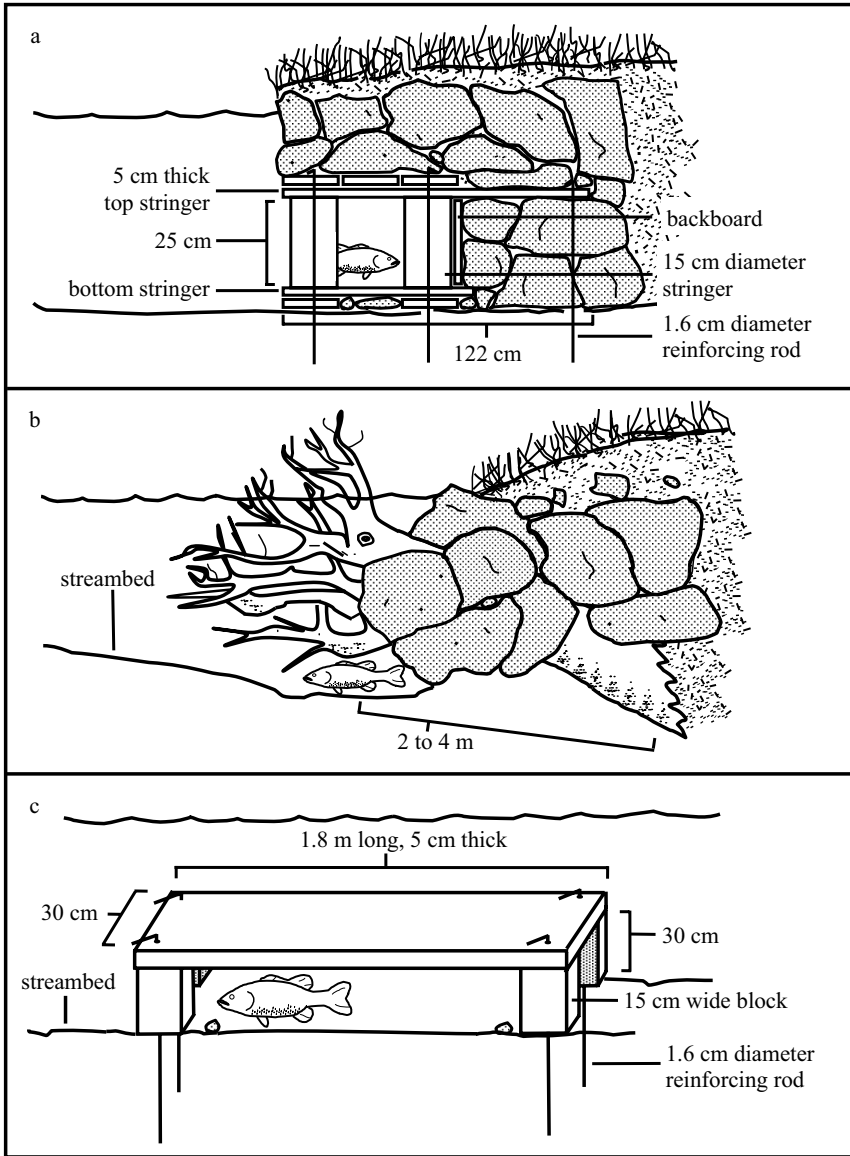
Lateral view of an installed LUNKERS (a) and rootwad enhancement structure (b). Side view of a modified Hunt half-log (c).
